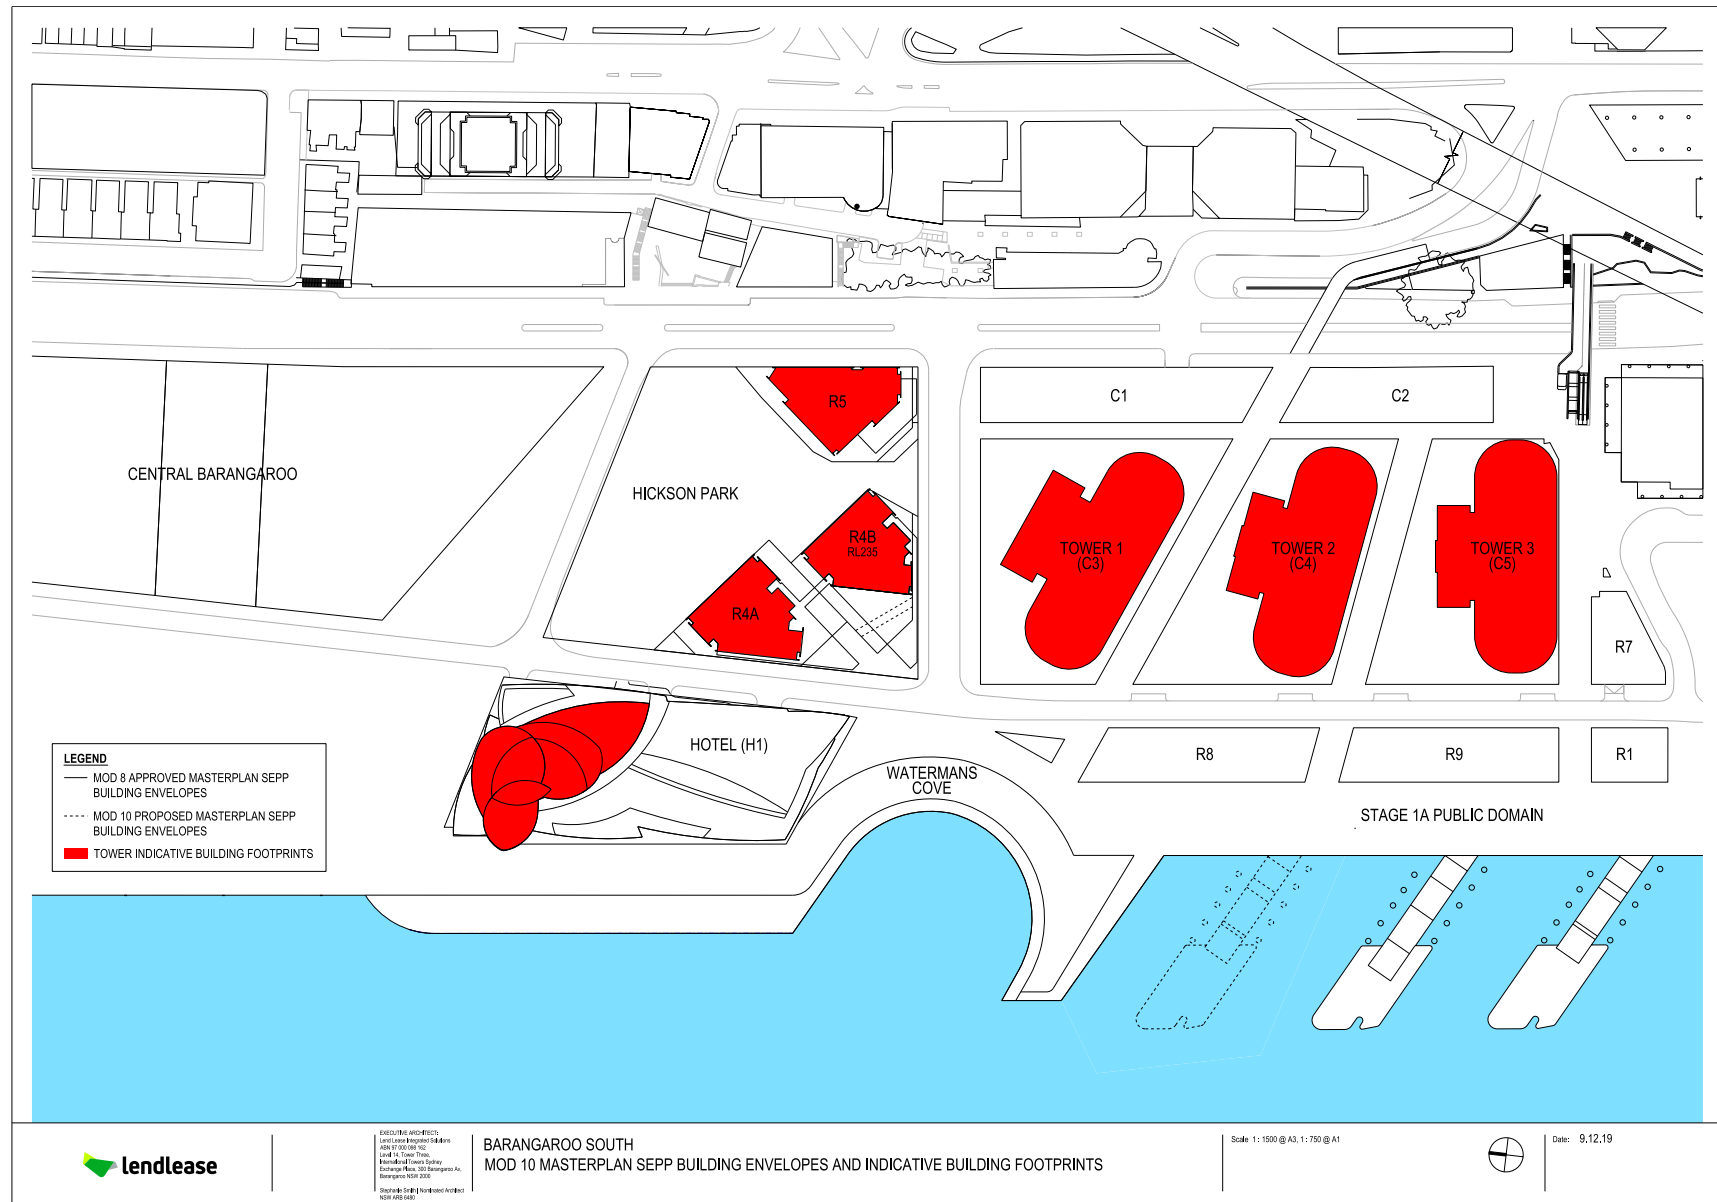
Barangaroo South Building Envelopes and Indicative Footprints
